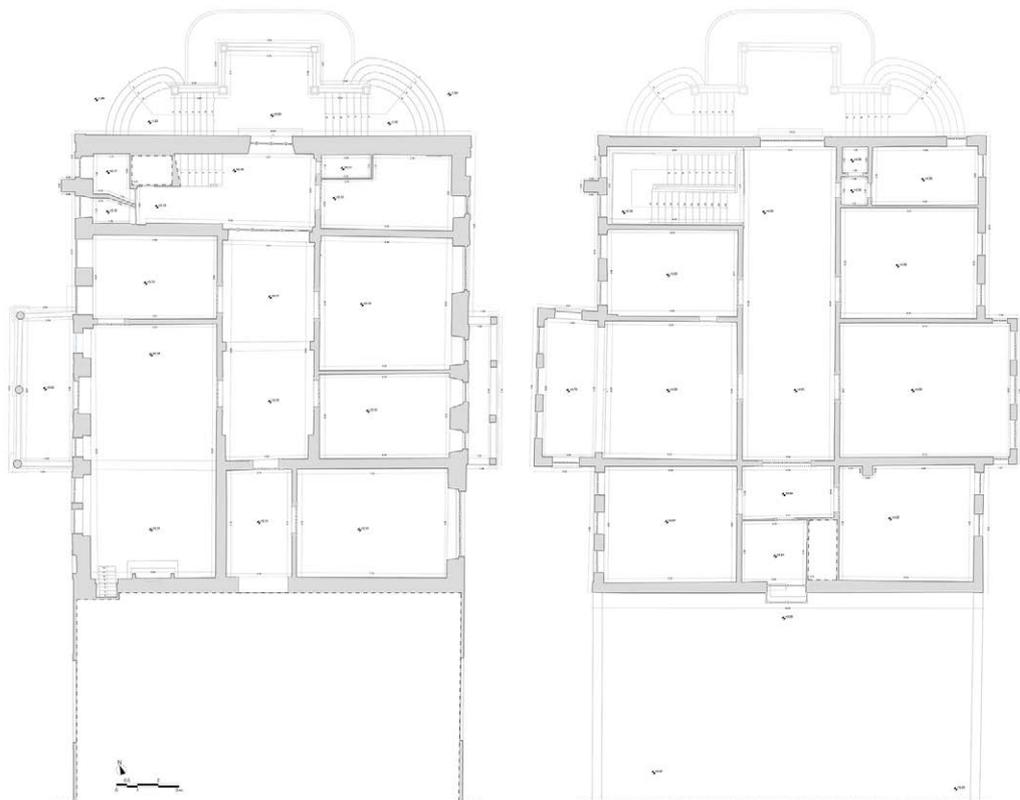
Ground floor and first floor plans of the Akademia e Shkencave Tiranë. Elaboration by CHM\_lab.
